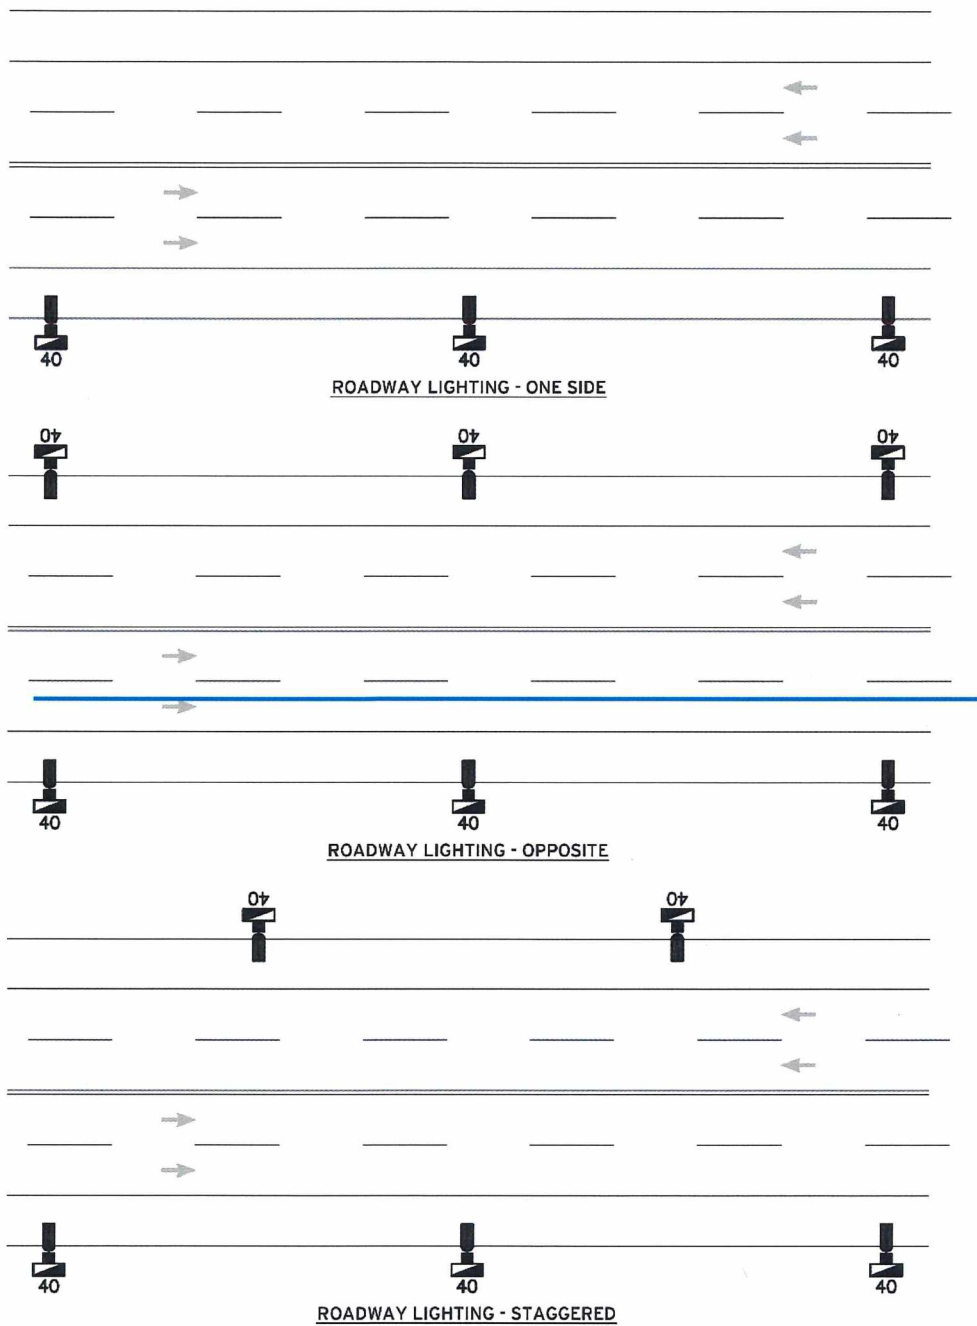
~~Exhibit 8-17~~ Typical Roadway Lighting Standard Arrangements
